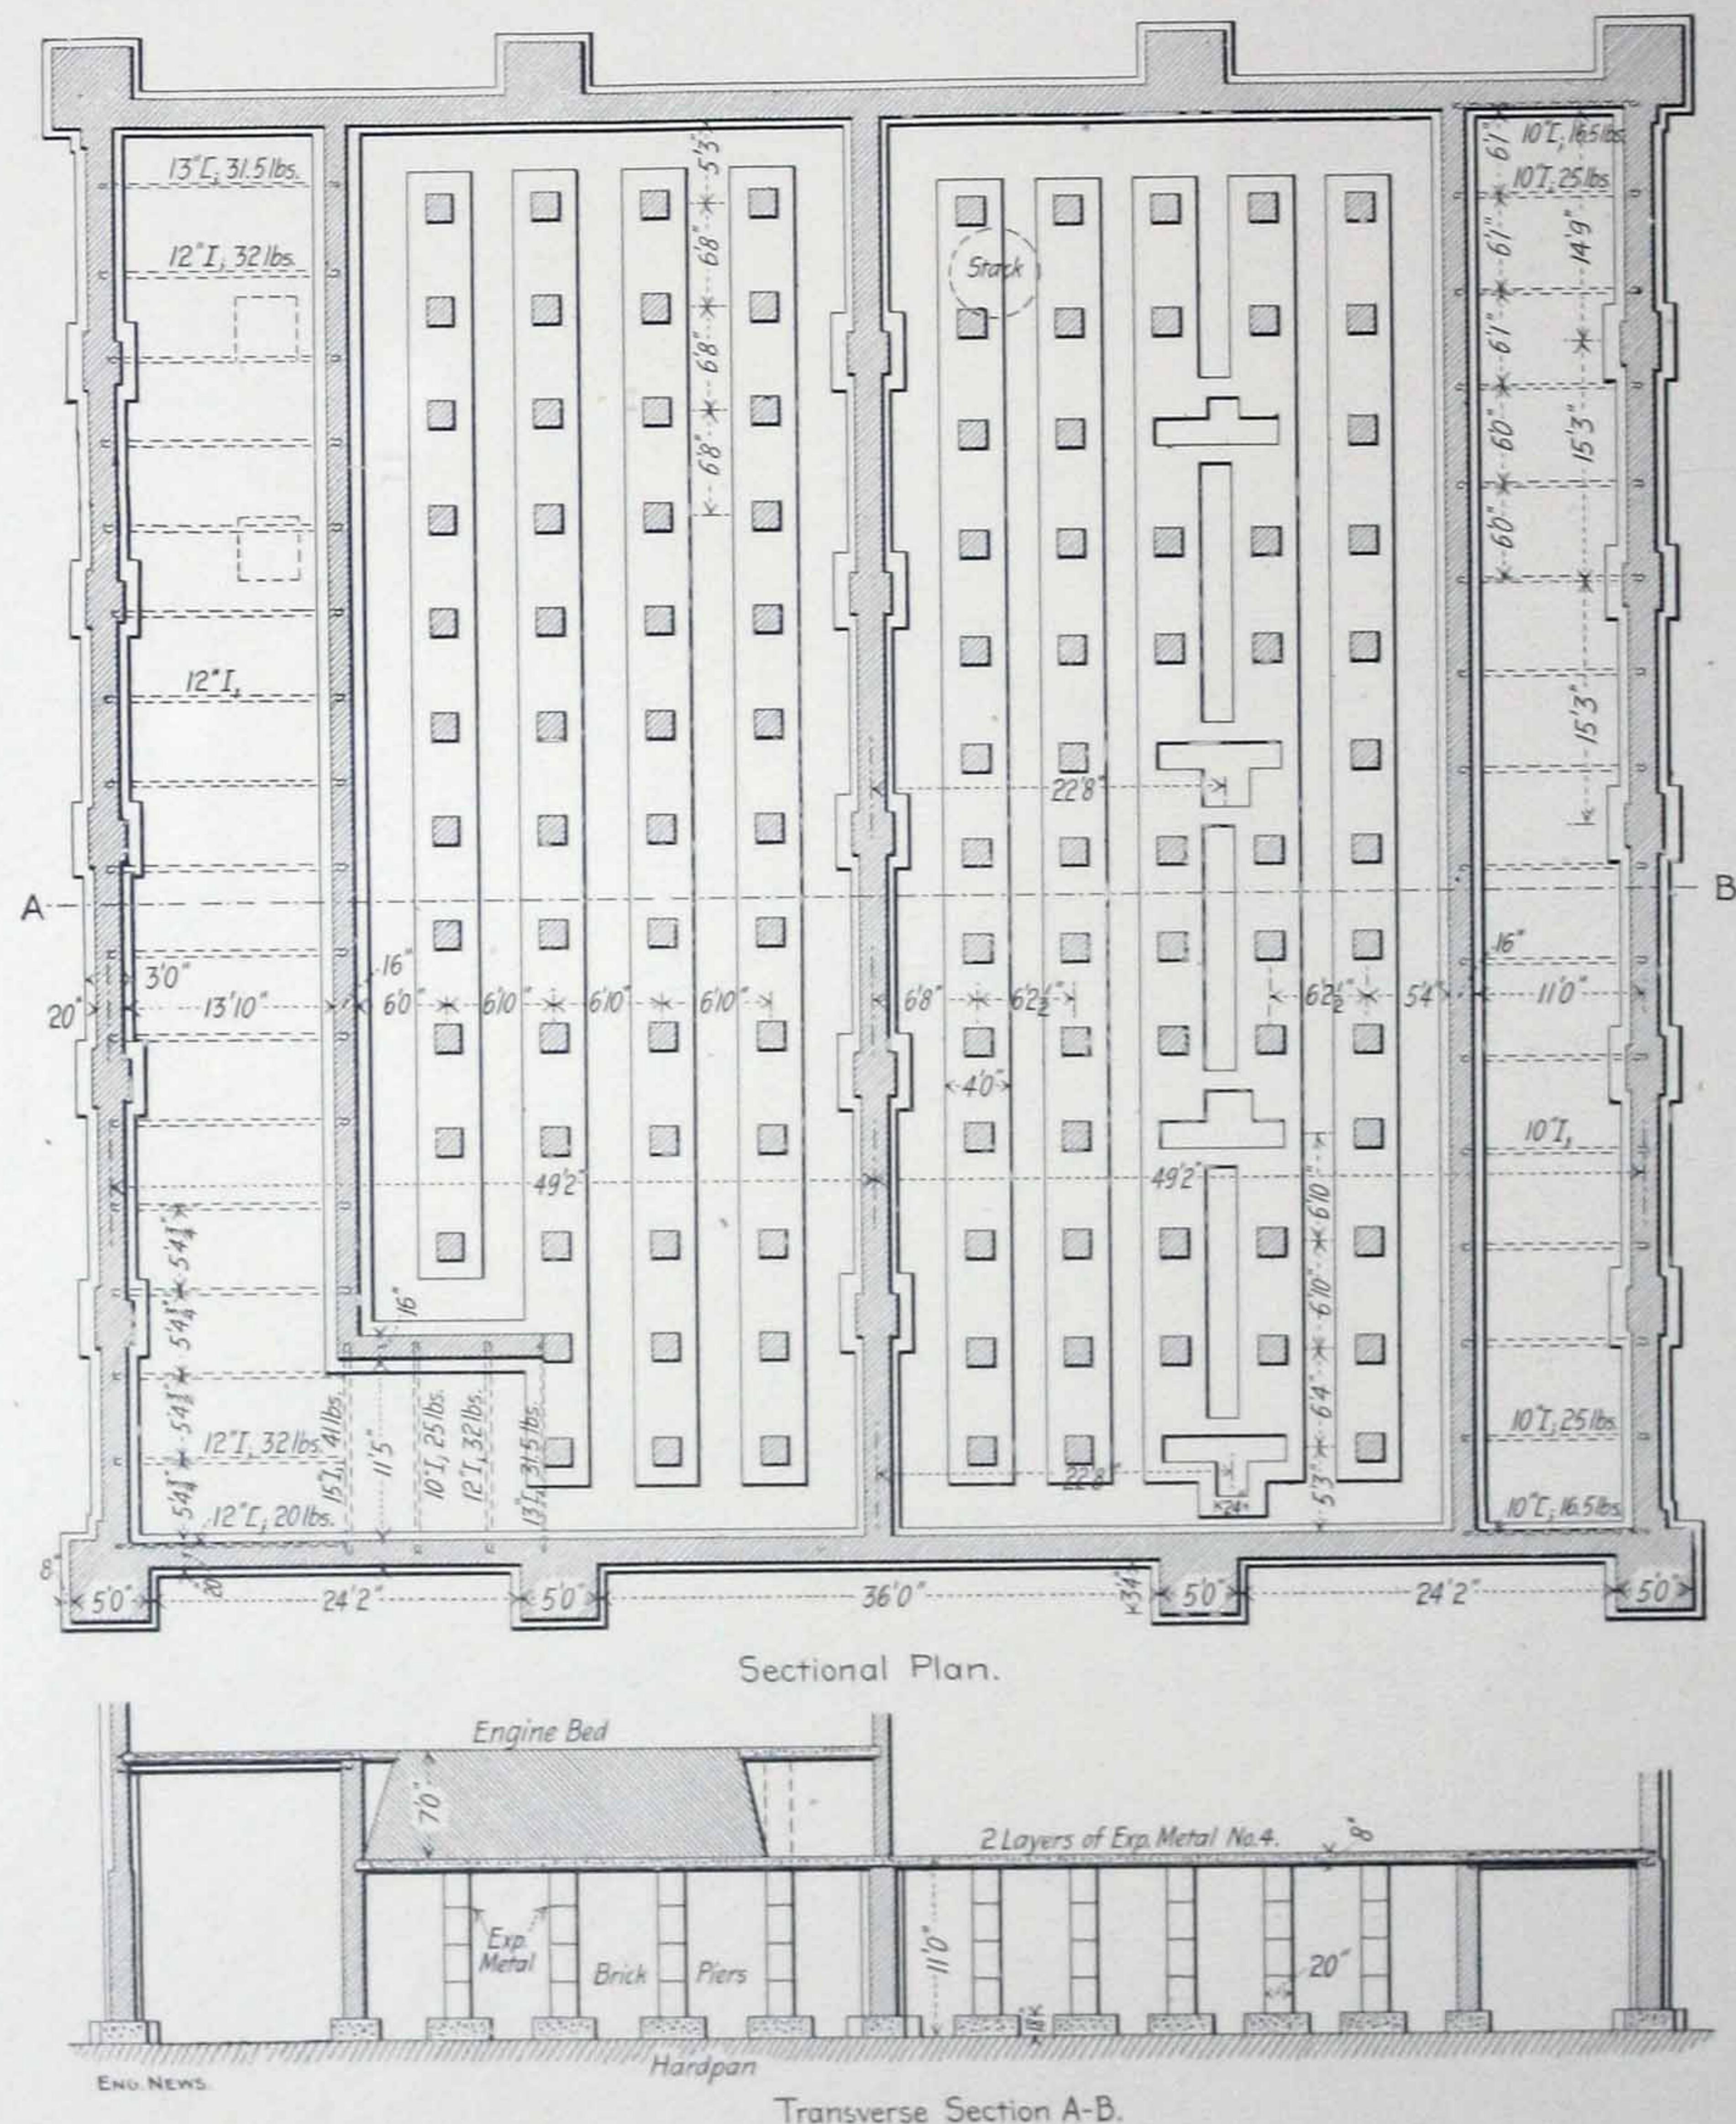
Expanded Metal-Concrete Floors in Power House, Far Rockaway, N. Y.
